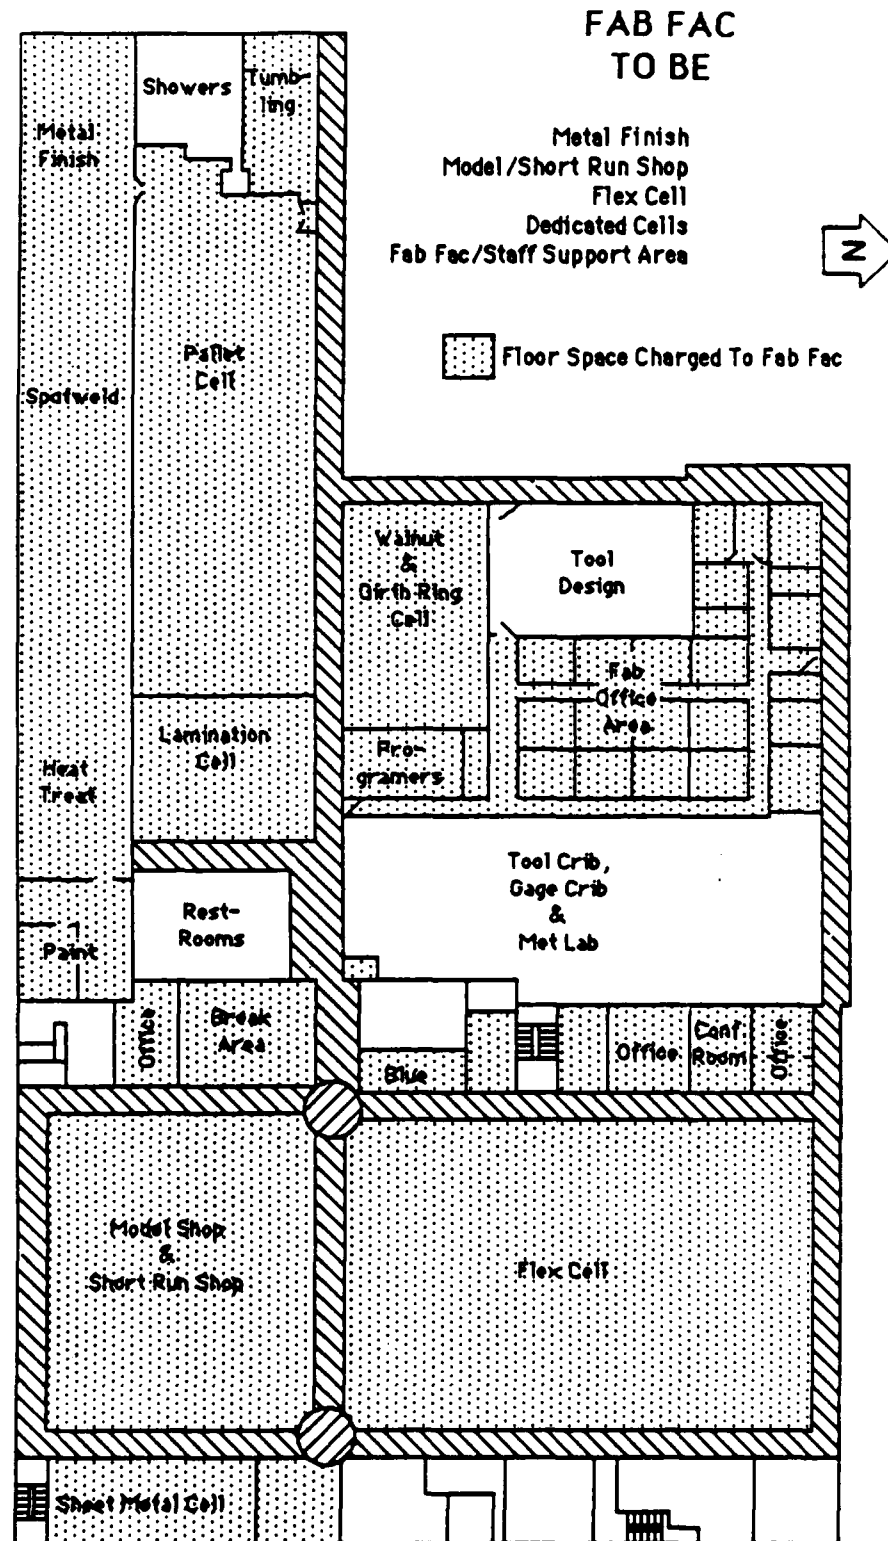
"To-Be" Fabrication Facility Floor Space Layout
